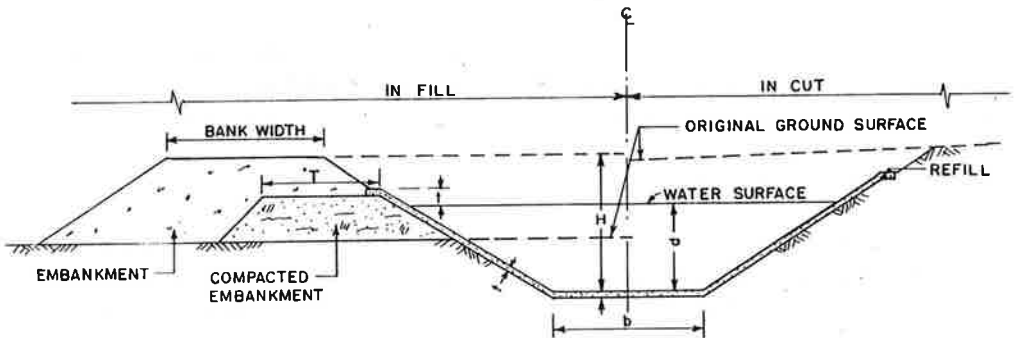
Typical Cross Section of a Hard Surface Lined Canal.
